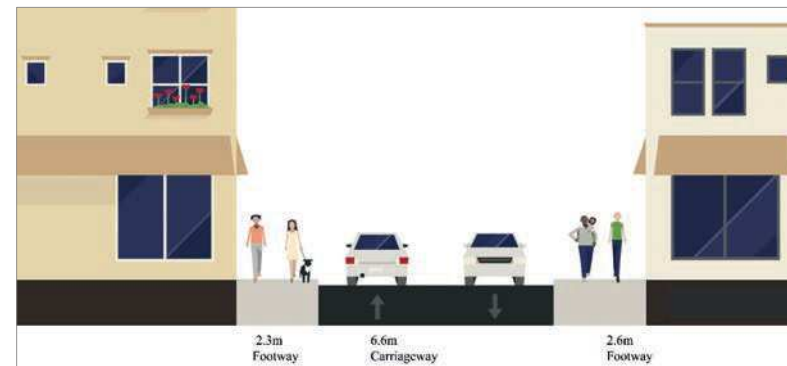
High Street Existing (without side street parking) (© Street Mix)
